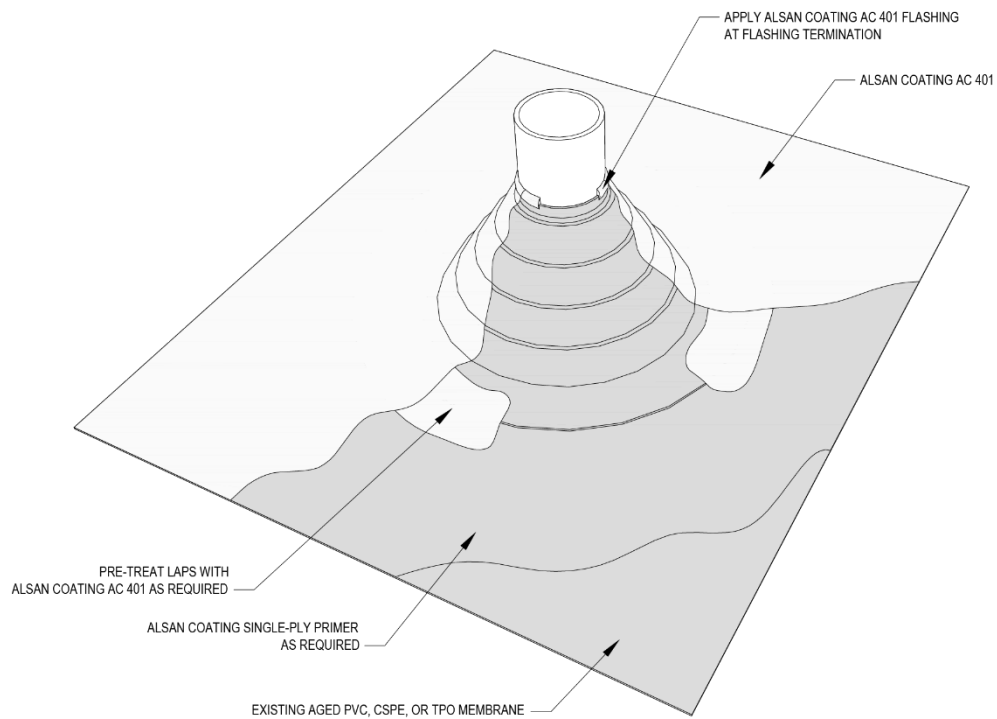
Acrylic Roof Coating Over TPO/CSPE/PVC, Penetration
